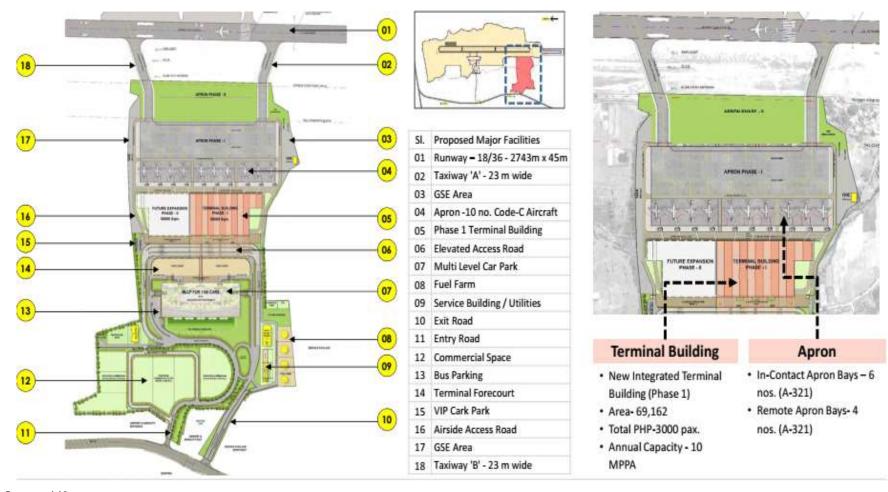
Proposed Master Plan of Civil enclave (Phase 1)
